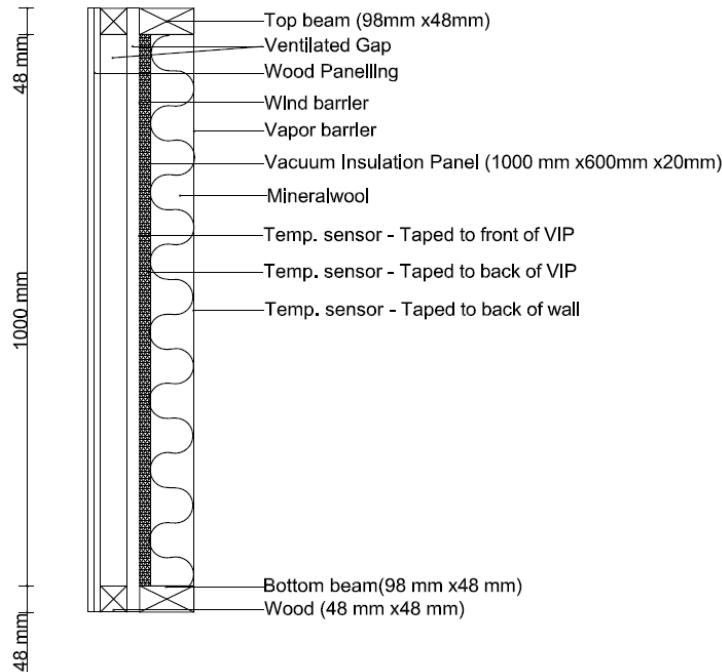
Construction detail for wall exposed to accelerated climate strains.
